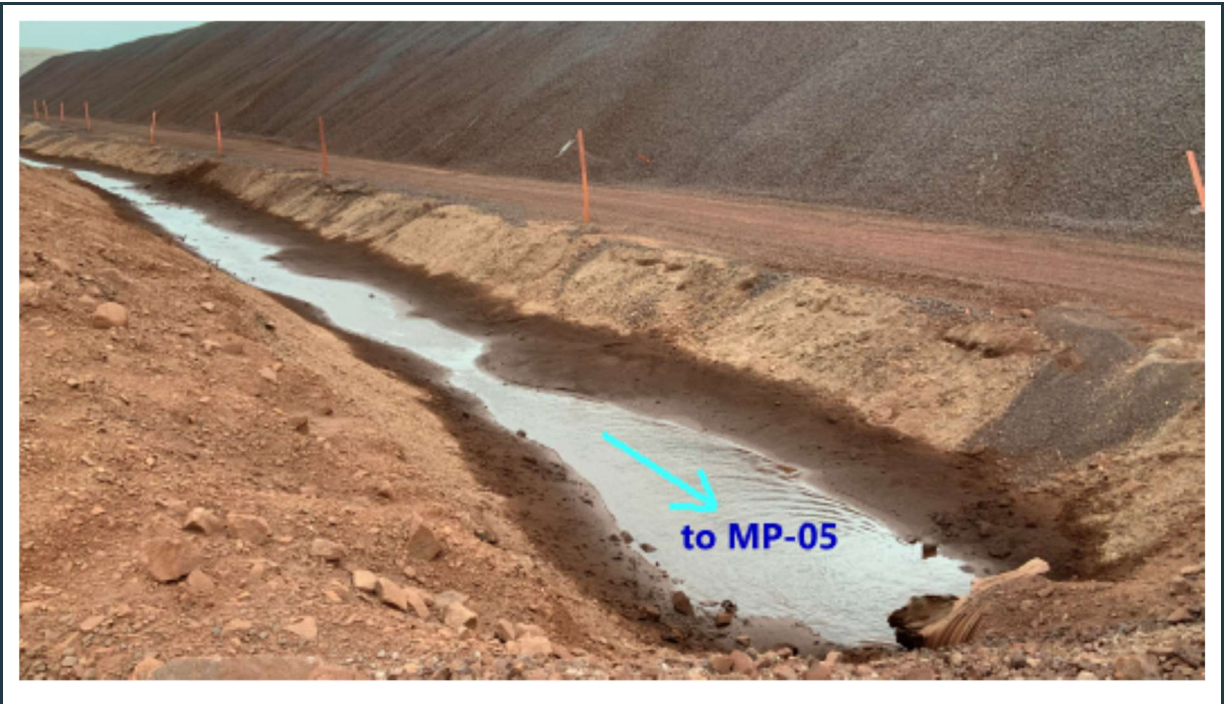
Surface water collection ditch adjacent (east) to the ore storage, draining to the MP-05 pond.
